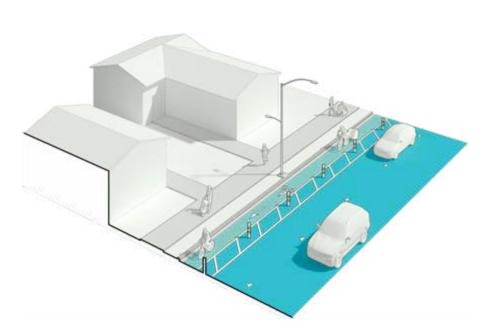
One-Way, In-Street Class IV Bikeway, Adjacent to On-Street Parking, Protected by Bollards and On-Street Parking.
